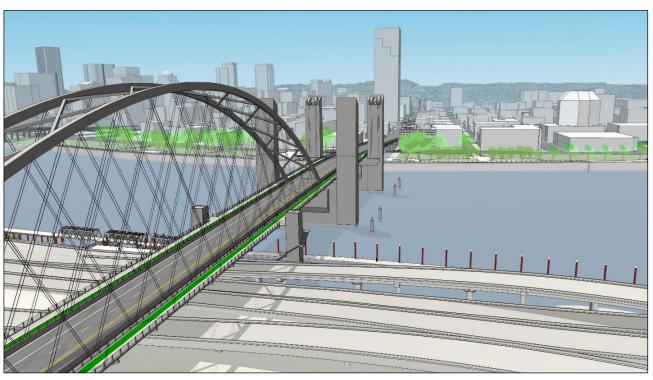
Span Combination 2 (girder west approach, vertical lift central span, tied arch east approach), artist's rendering, view looking southwest (Fat Pencil Studio, 2021).
